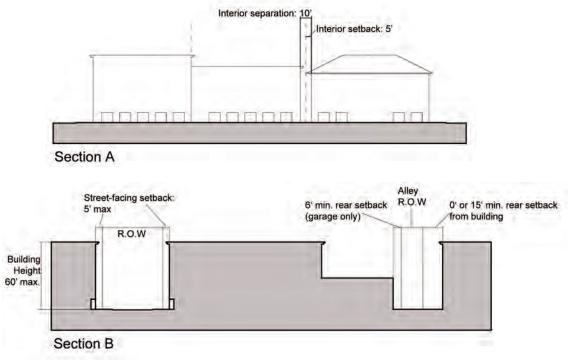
Mixed Use Area Buildings with Storefront Section diagrams
